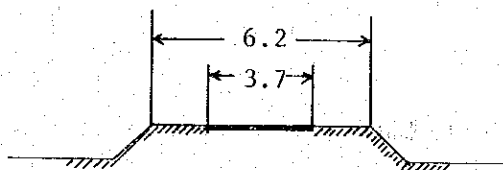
Standard Cross Section of the Road in 3-G zone
